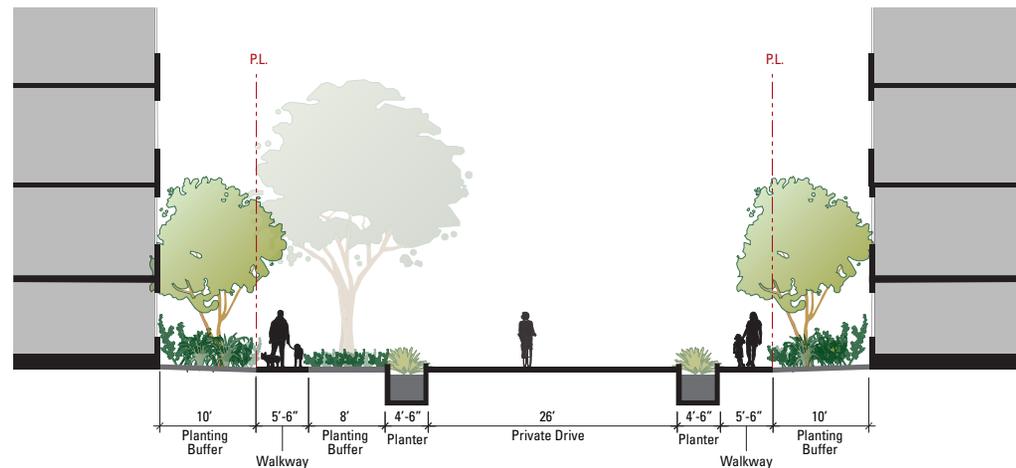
Section H. Garner Drive and Tubman private drive typical section
